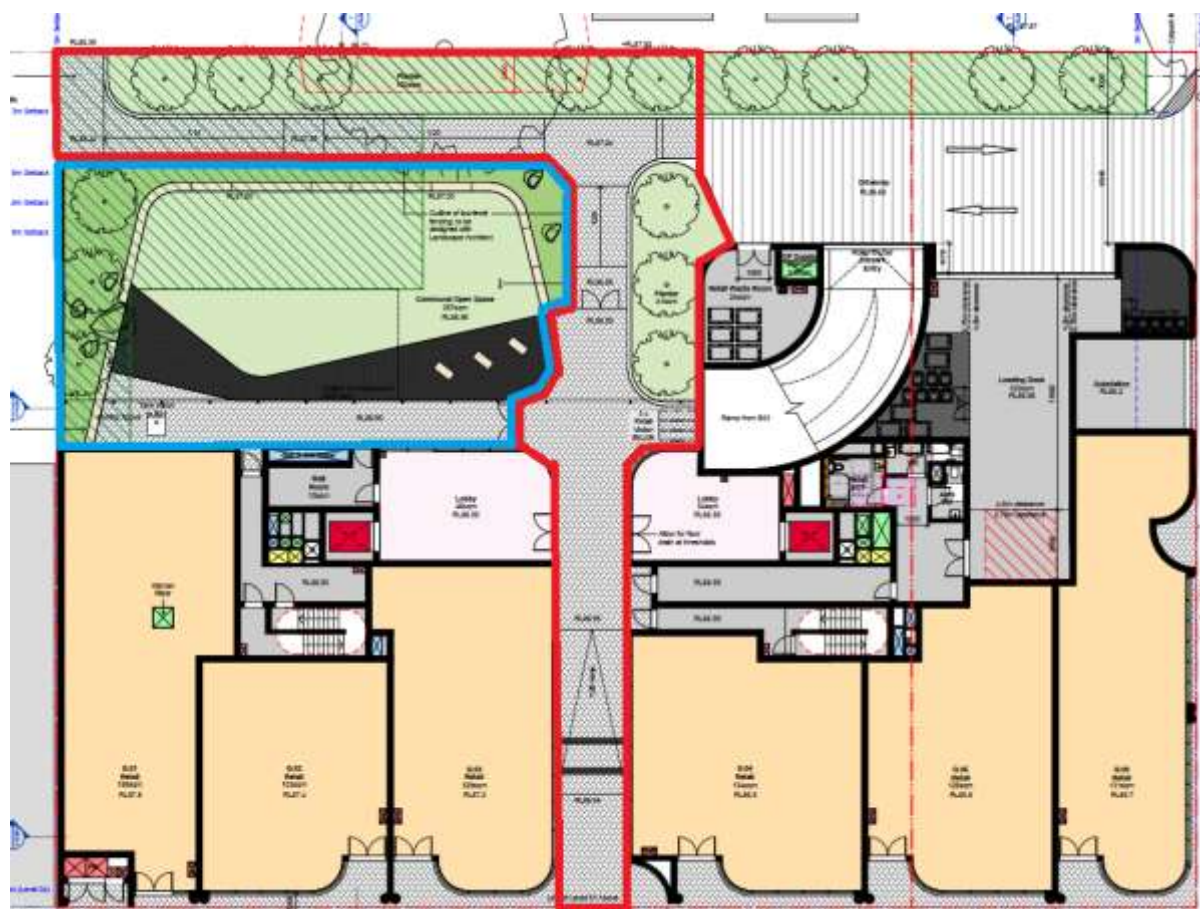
Extract of the Applicant's General Arrangement Plan showing in red the proposed L-shaped through-site link connecting from Strathallen Avenue (bottom of the image) to the norther boundary of the site (top left corner of the image). The area highlighted in blue is the remaining communal open space area following establishment of the link.
